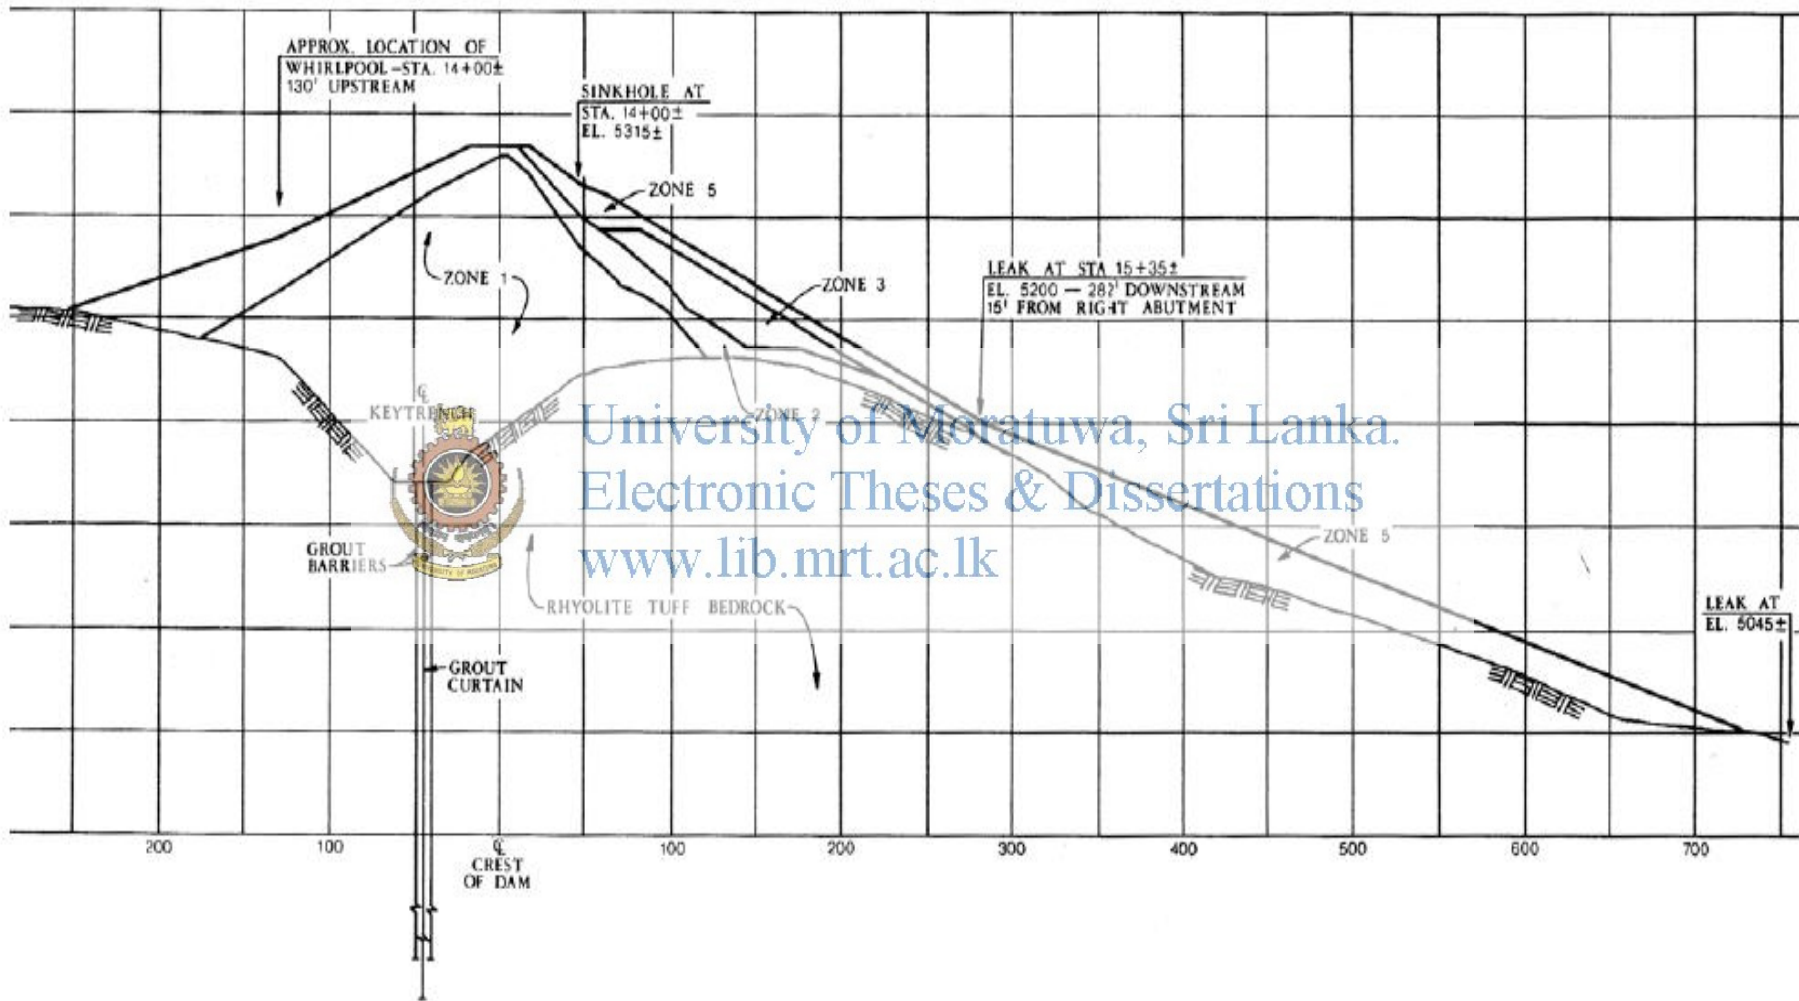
Cross section of the dam at the right abutment (IP, 1976) (Sasiharan, 2003)
